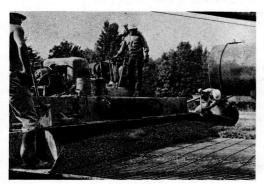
Spreading concrete with Jaeger-Lakewood finishing machine in continuous wire mesh section.
